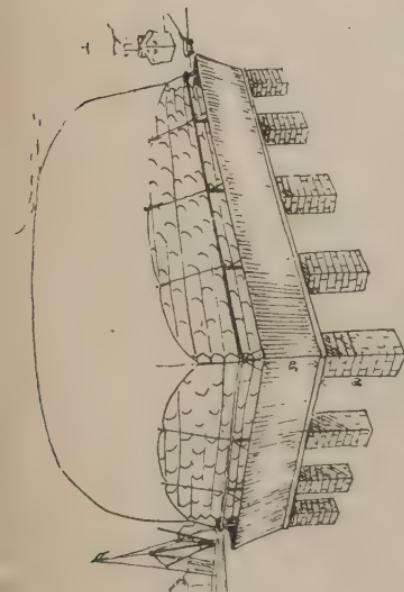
Stacked on slightly raised concrete bed set into ground. Galvanized iron sheeting is placed round the platform as in fig. 62.
